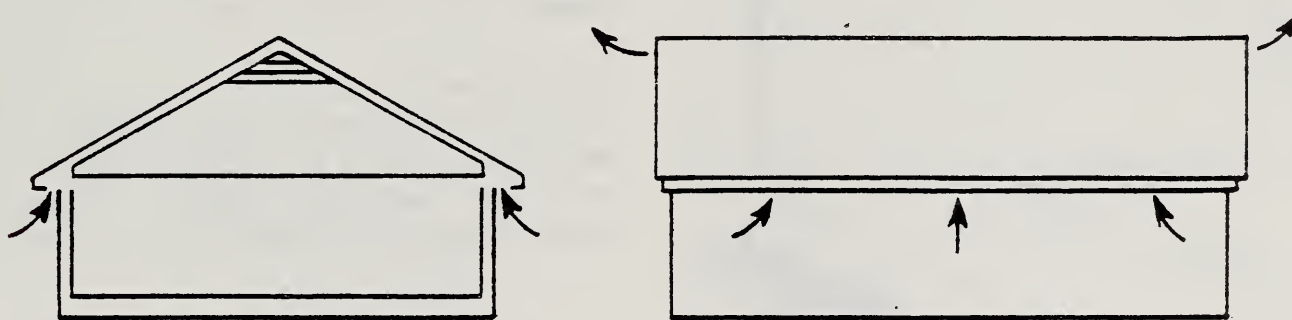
Inlets at eave, outlets at ridge for good ventilation.
